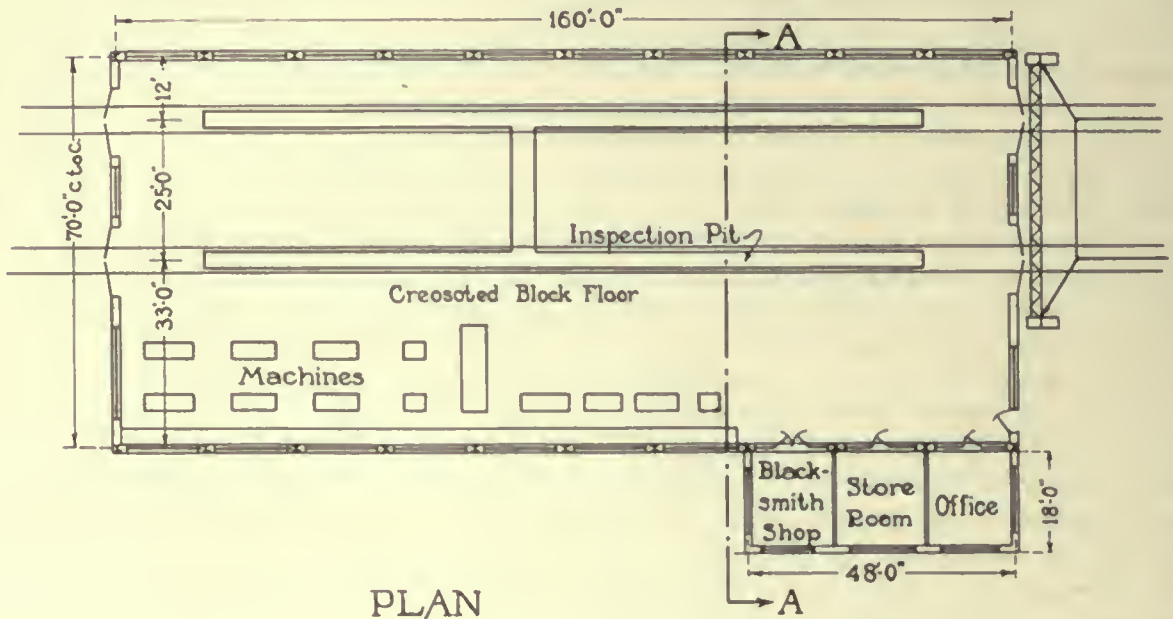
shows plan and elevations of a standard house for the care of electric locomotives at a location where the facilities of a general machine shop are not available. Certain shop facilities are therefore to be provided in this building. Such a building will be required in locations where provision is needed for the care of electric locomotives which cannot conveniently be taken to the more extensive shops at transfer yards. An example of conditions which give rise to the need of such an arrangement is to be seen in the Garfield Boulevard plant of the Pittsburgh, Fort Wayne & Chicago Railway, from which, it is assumed, the present machine shop facilities will be removed to the new transfer yard to be provided at Clarke Junction, Ind. Since, under the plan of electrification, the Garfield Boulevard Yard will be a terminal for electric locomotives, shop facilities for all except the heavier repairs must be provided.
